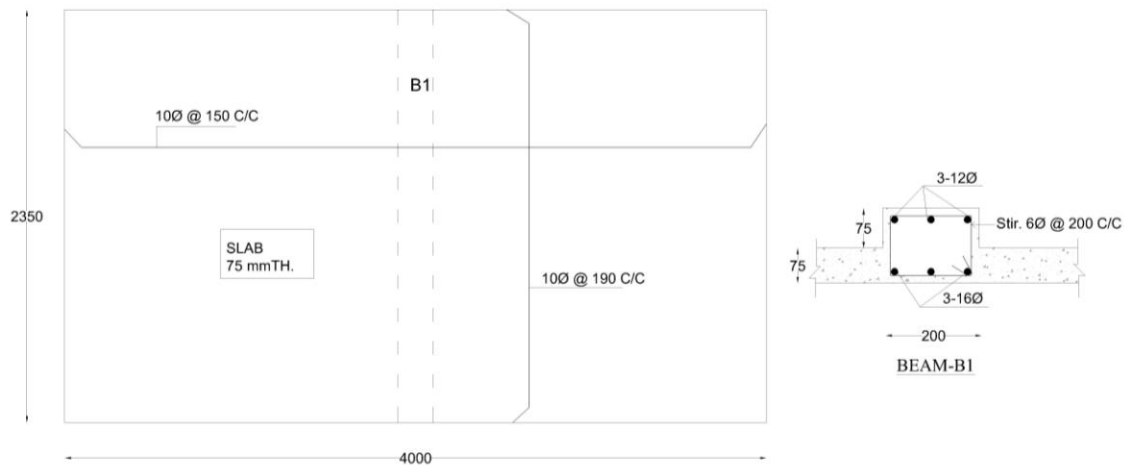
Reinforcement Detailing of Slab, 2PSF
